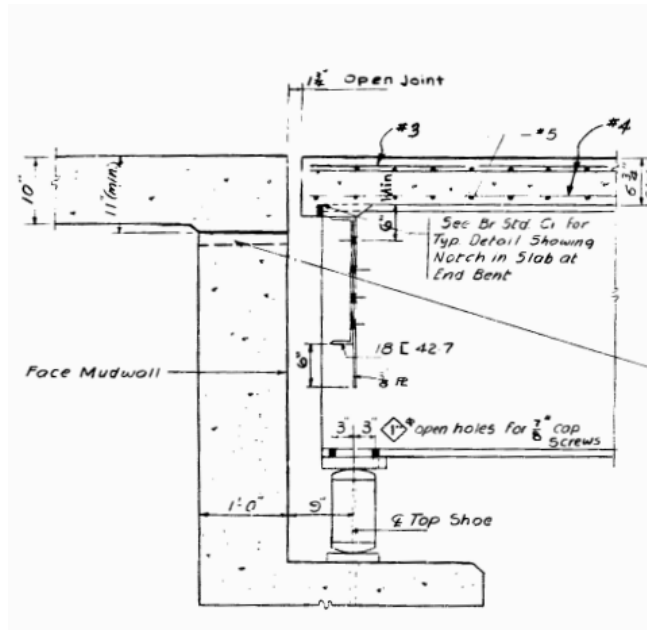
Abutment Detail of the Bridge (NBI 14280) (1867)
